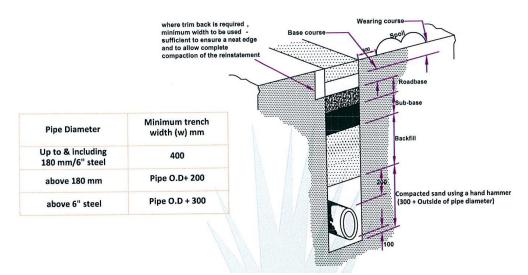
Typical backfill arrangement (Source: EGAS technical drawings)
